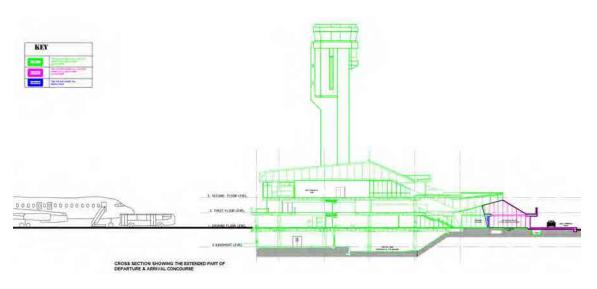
Passenger Building Expansion Plan by ADL (cross section)
